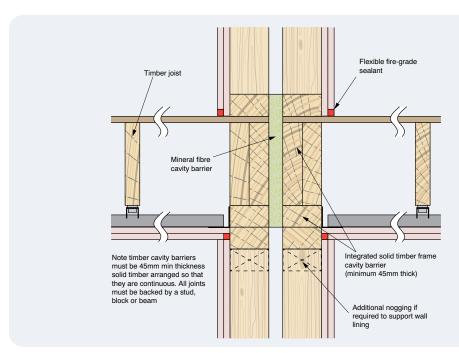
Fire-protected timber frame wall/floor junction with integral cavity barriers – beams parallel to wall Class 2 building.
